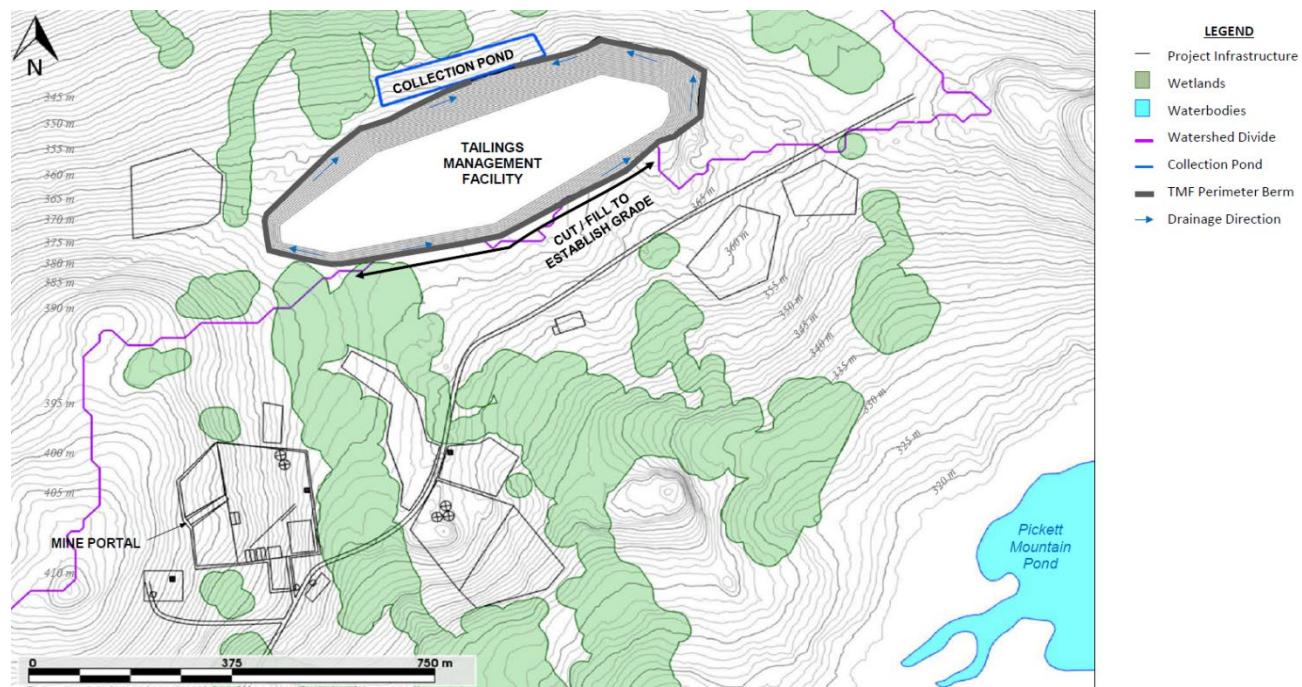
Plan Showing General Arrangement of Tailings Management Facility
